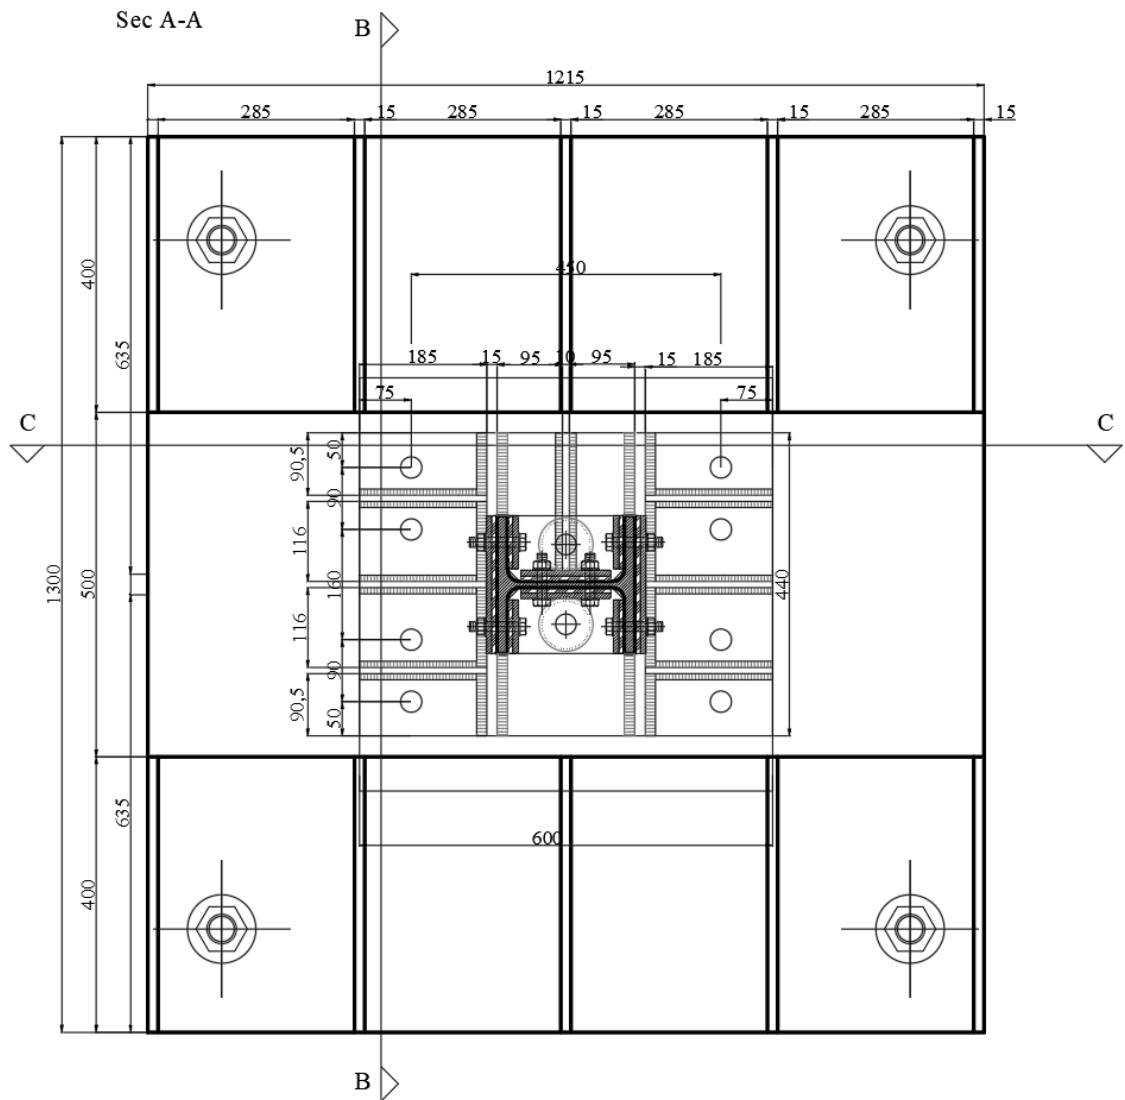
Detail of the base plate in plan (dimensions in mm)
